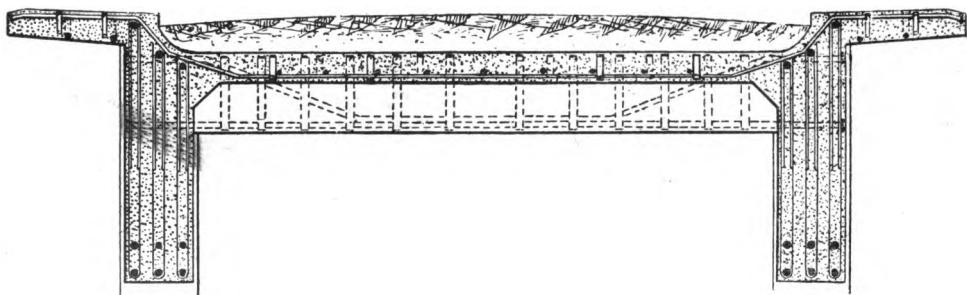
A Cross Section of a Bridge Showing Hennebique System.
